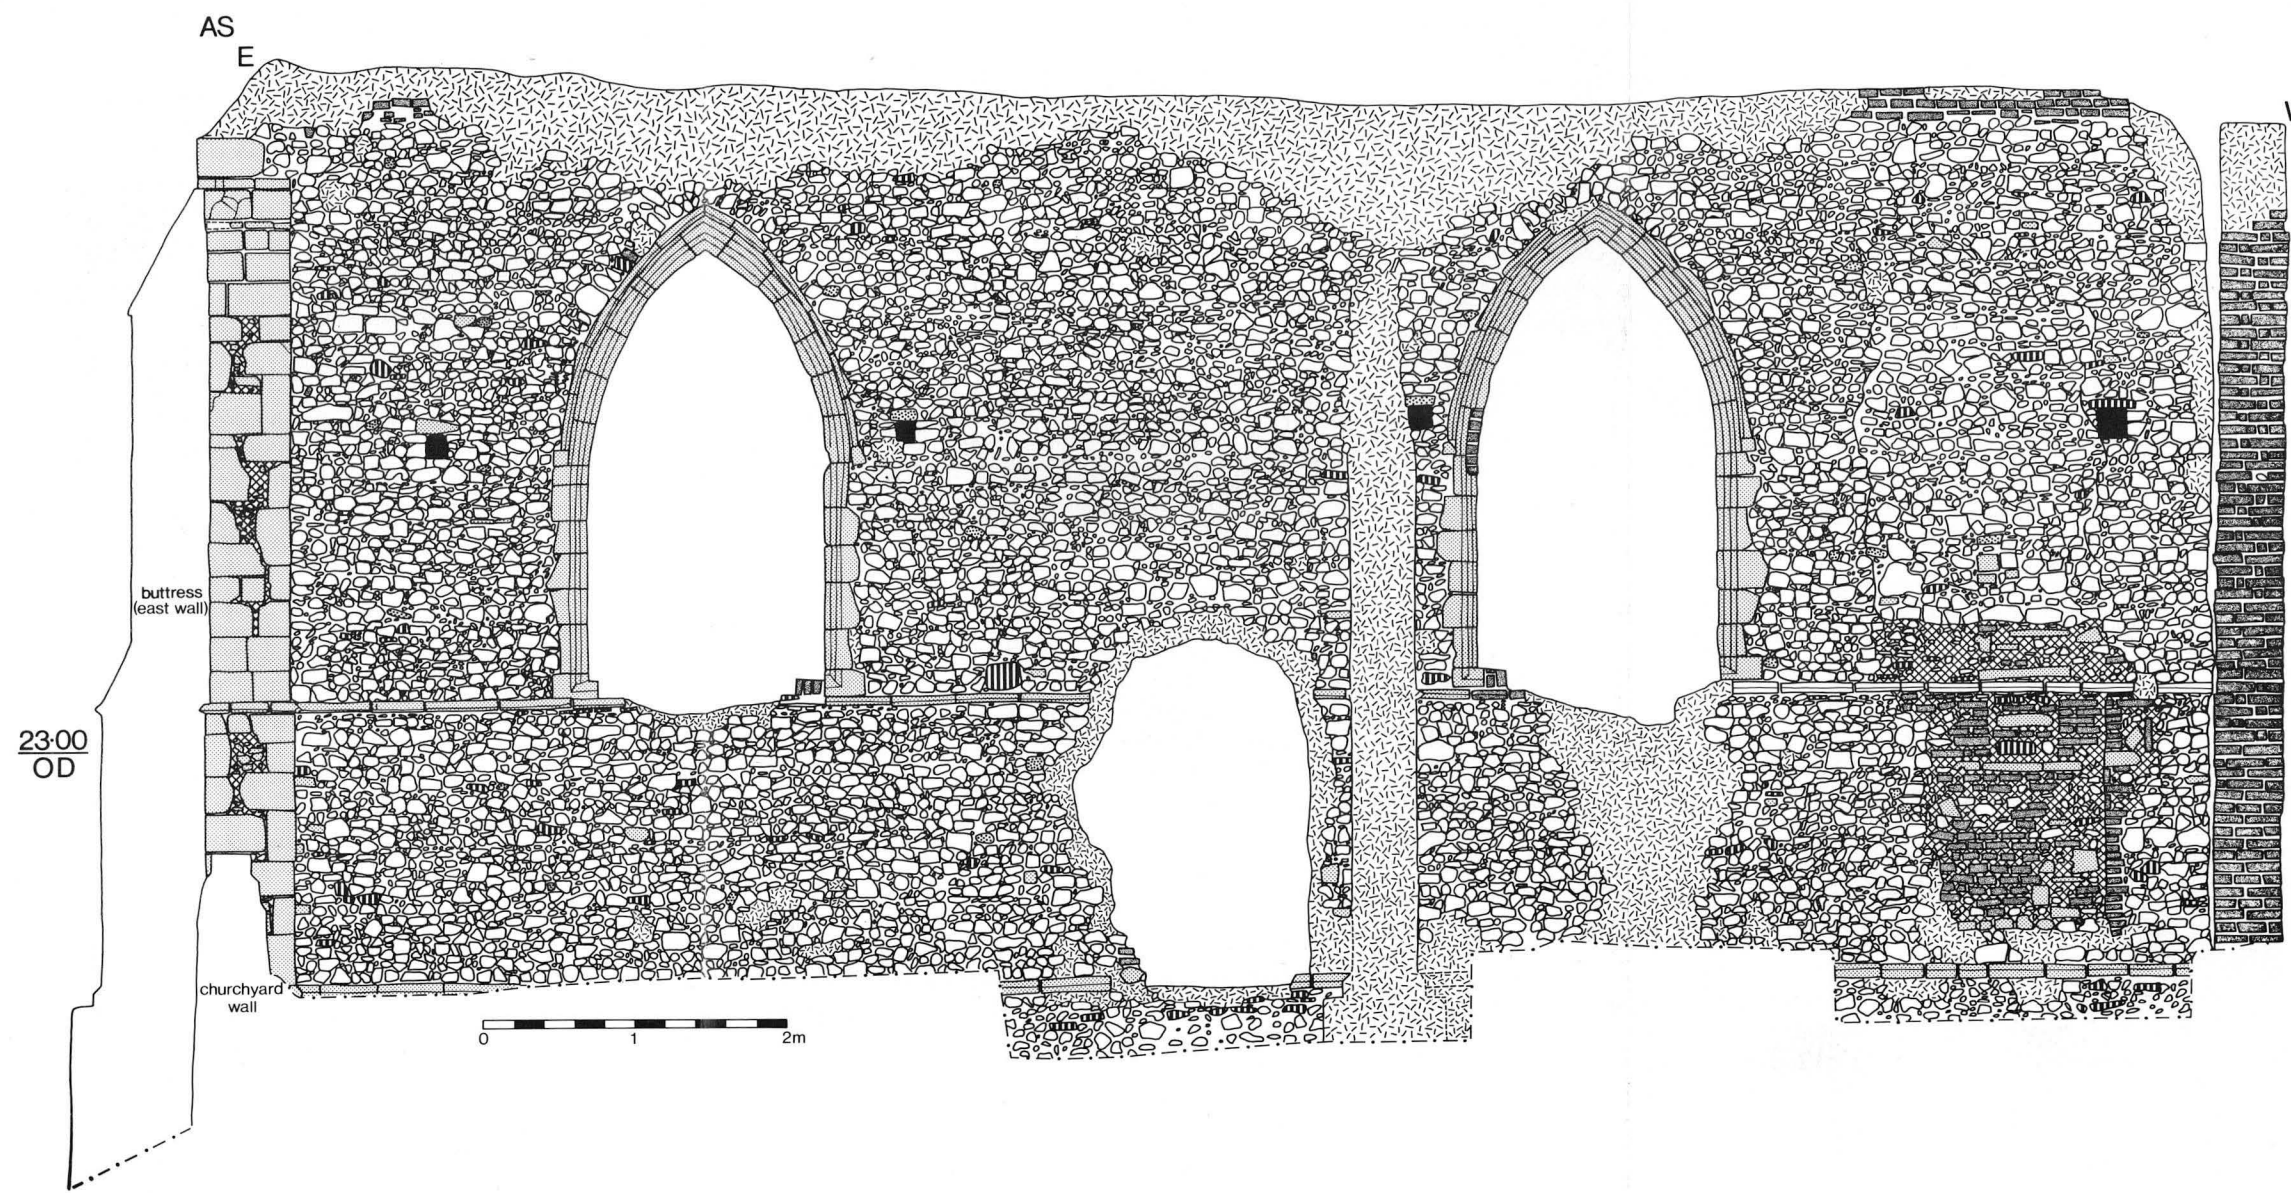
Elevation AS-AT of exterior north wall of the chancel. Scale 1:50
